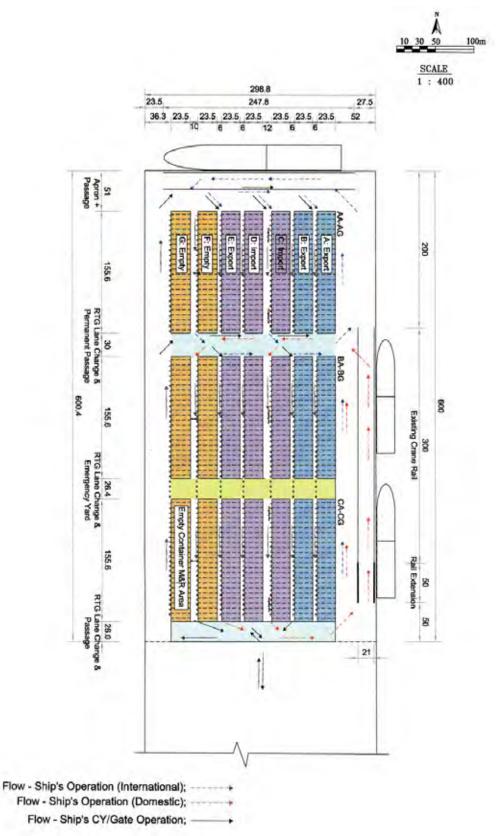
Facility Layout Plan of the Case Study Area of Pier 3
